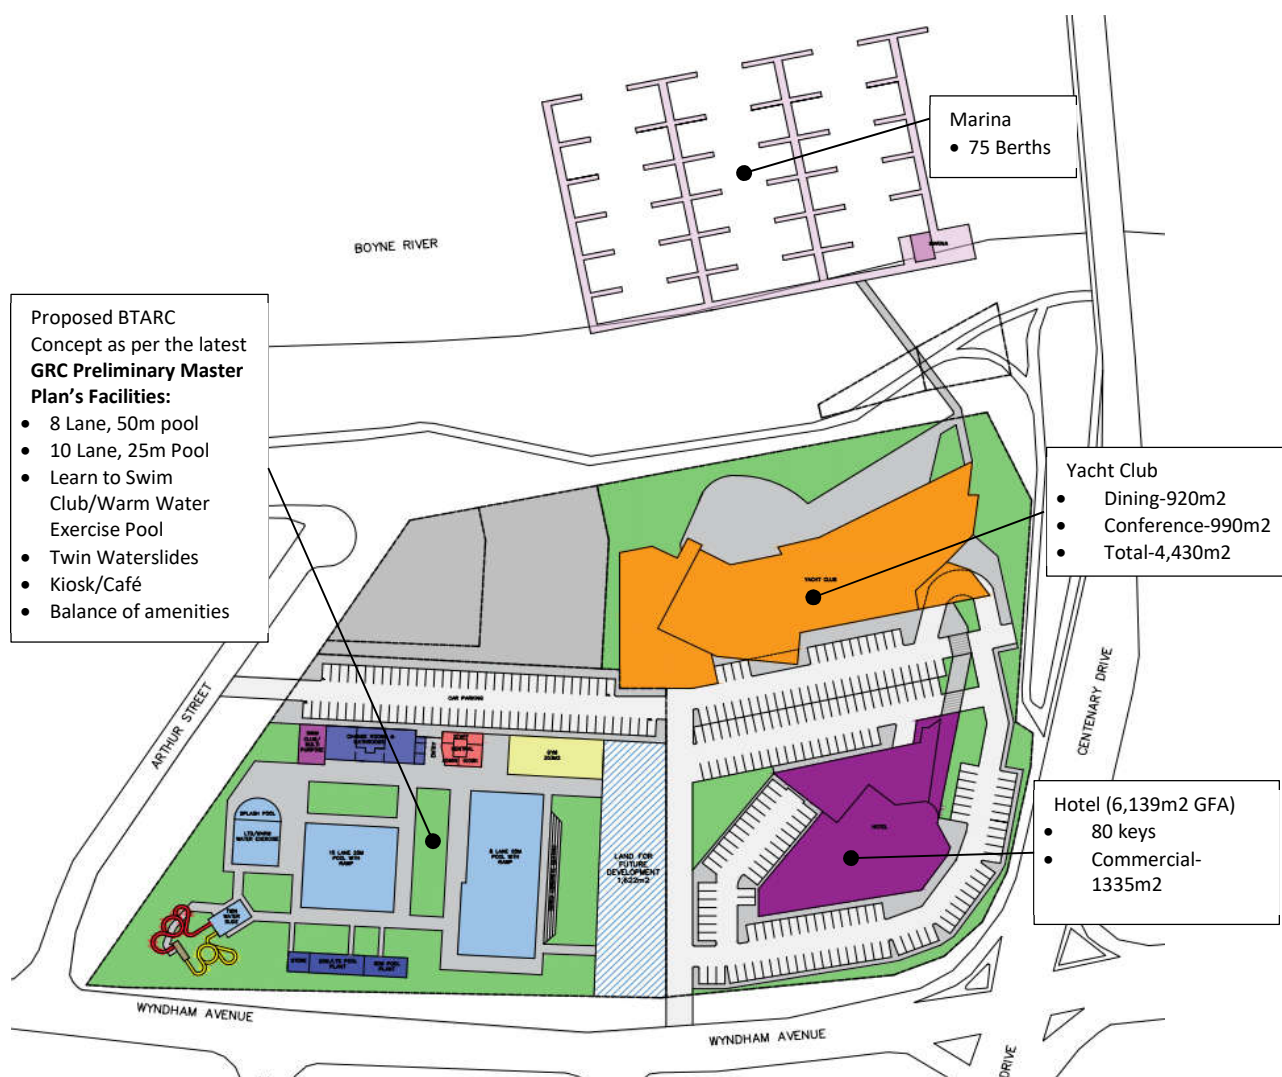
Subject Site's Proposed Development Plan (Refer to the Appendix for the Complete Proposed Development Plan & Proposed BTARC Concepts)
